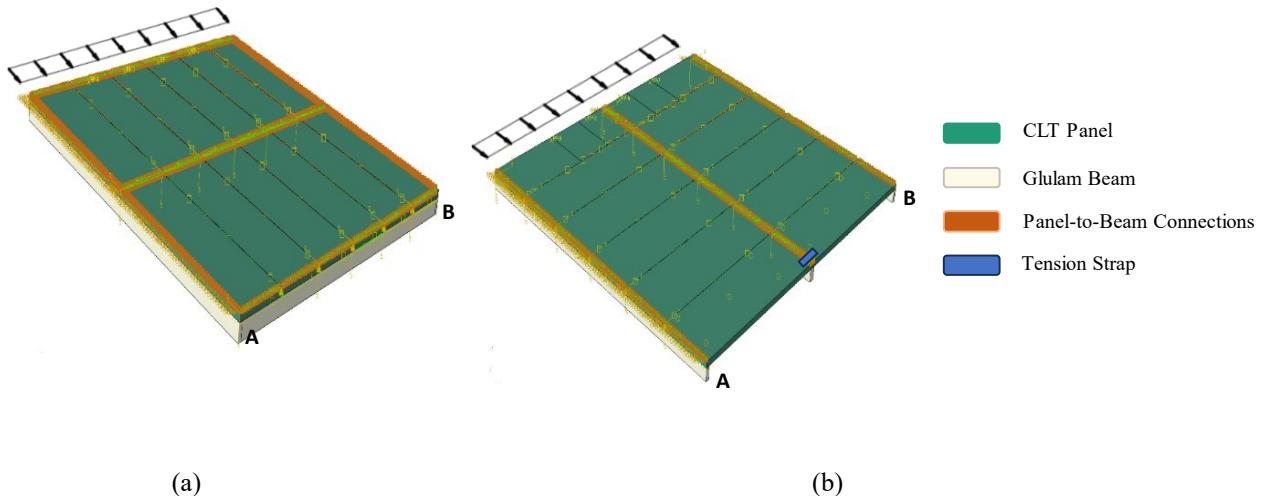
Diaphragm assemblies when the load direction is applied (a) parallel to the panel joints or (b) perpendicular to the panel joints.
